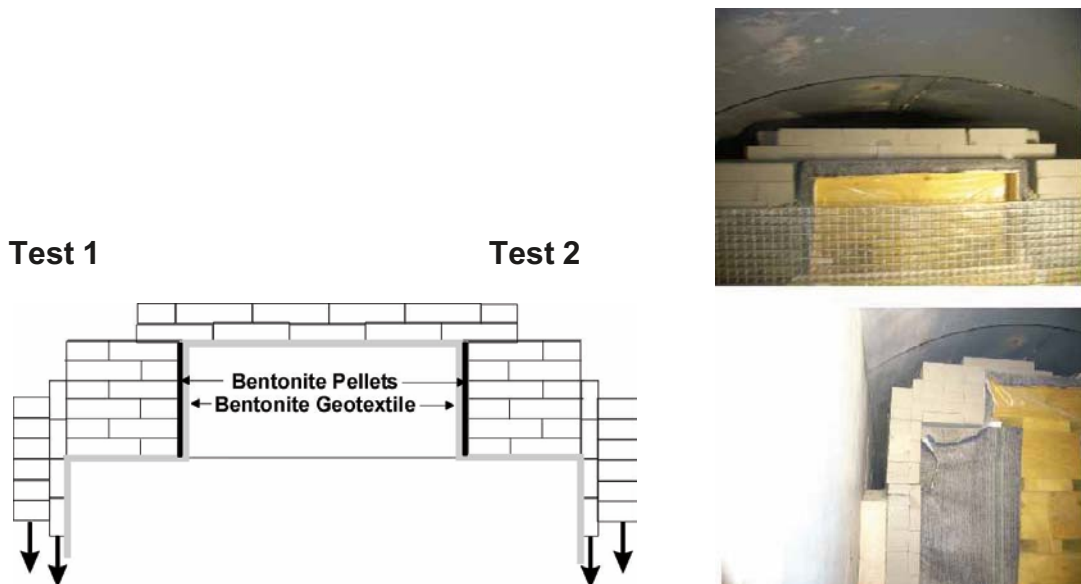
Details of spacer and block assembly in upper portion of Assembly 1.
